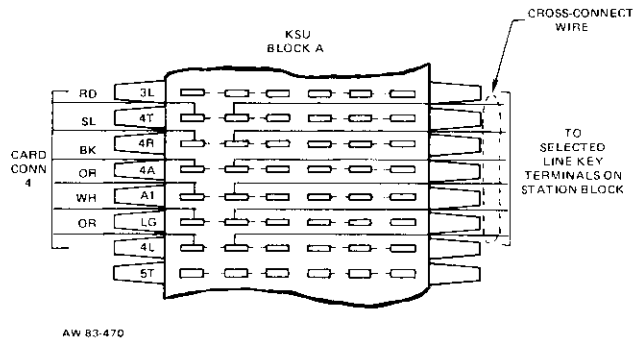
Connecting Details, 415A KTU to Multibutton Station
